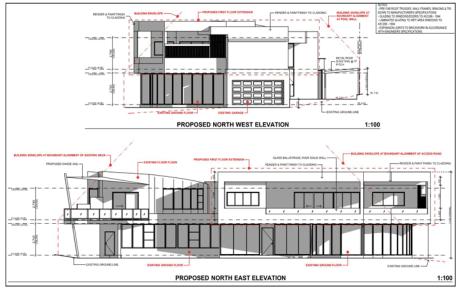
North West and North East elevations of proposed alterations and extension to dwelling.
